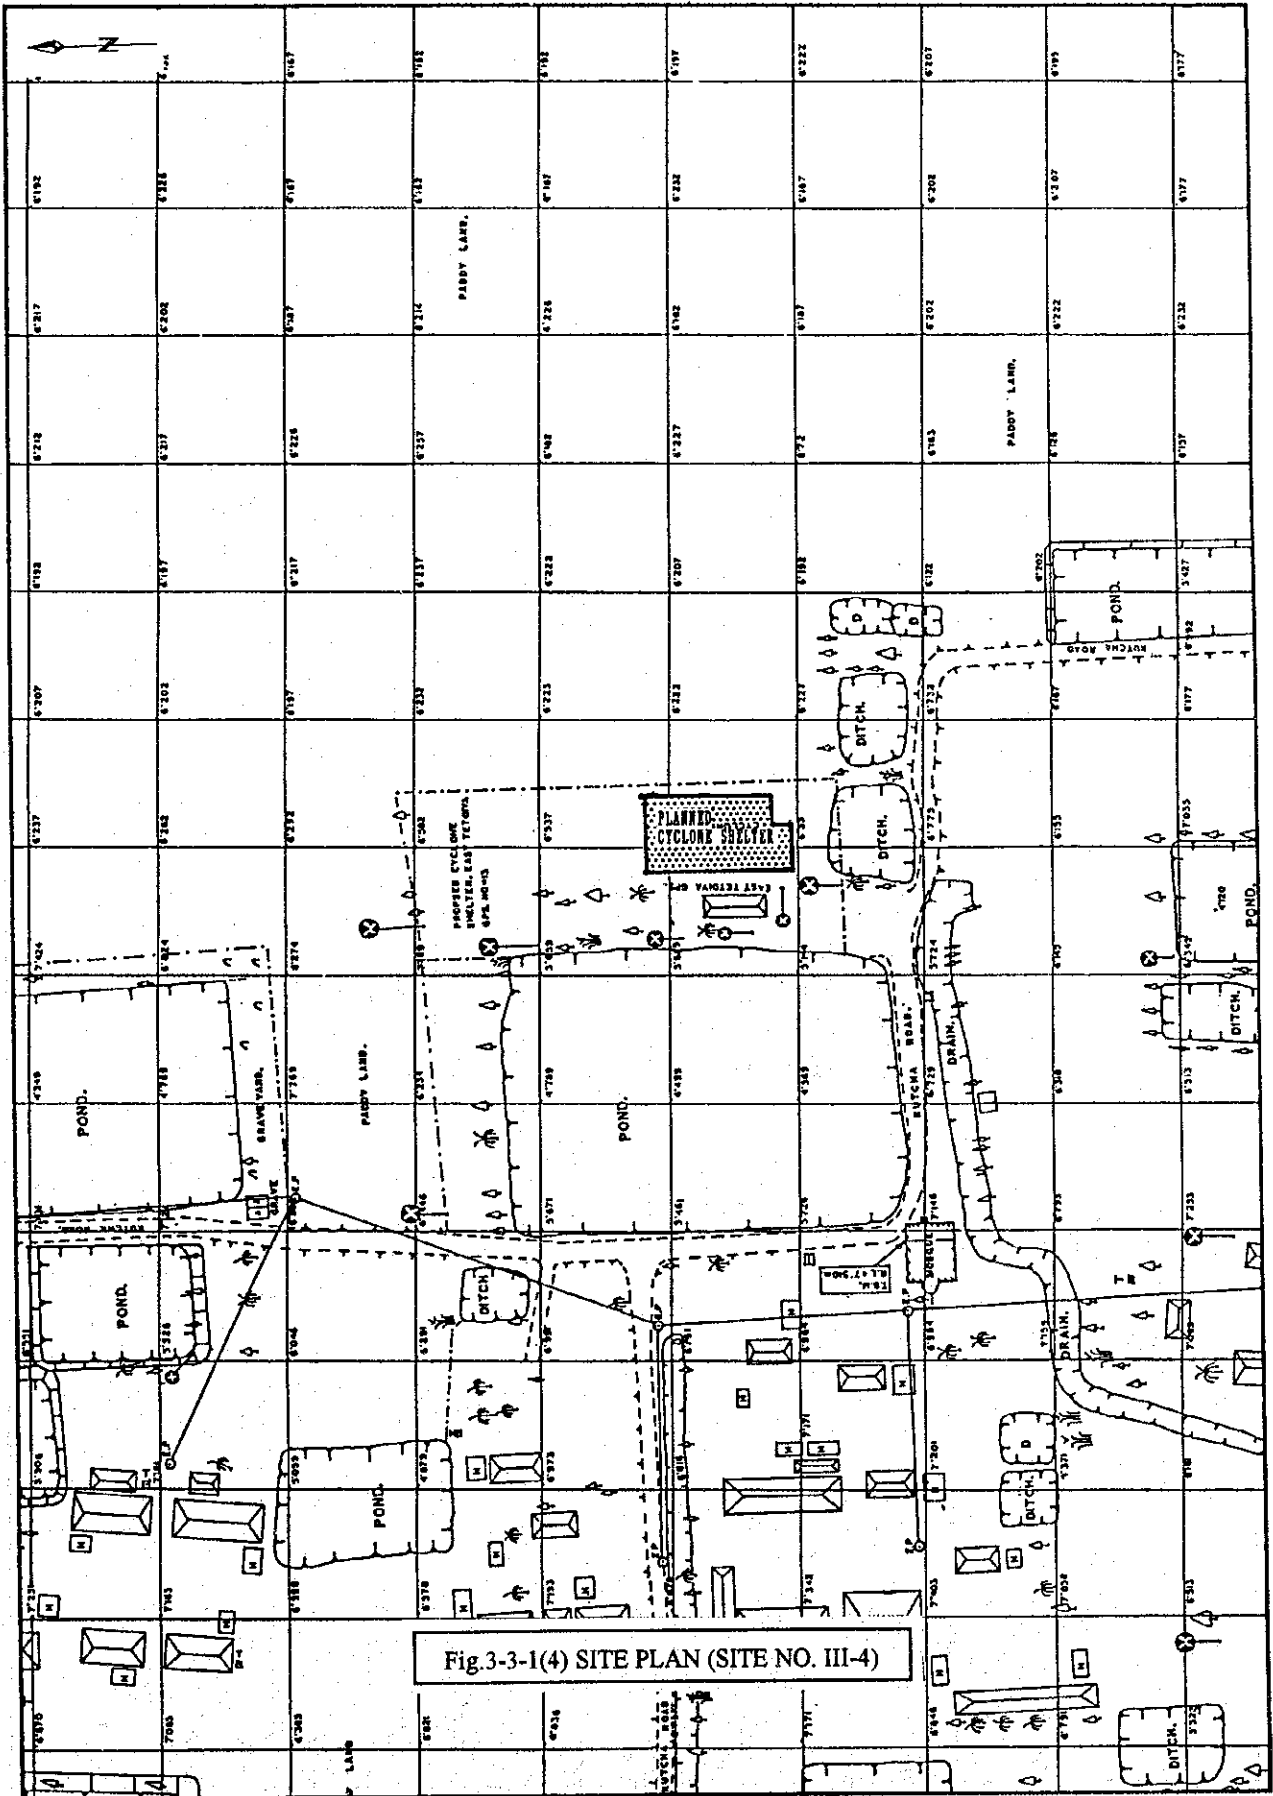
(4) SITE PLAN (SITE NO. III-4)
